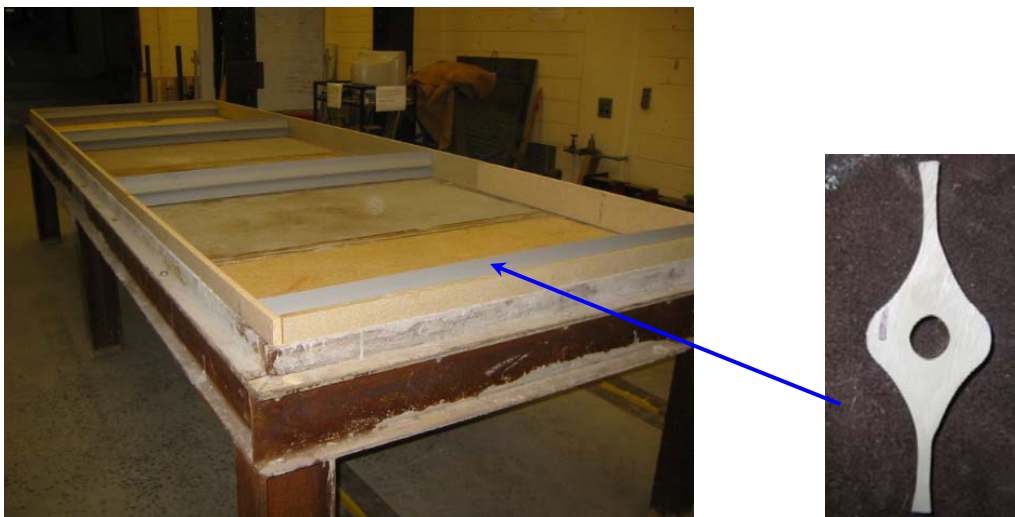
The locations and the cross-sectional shape of TripStop™ PVC joiners
